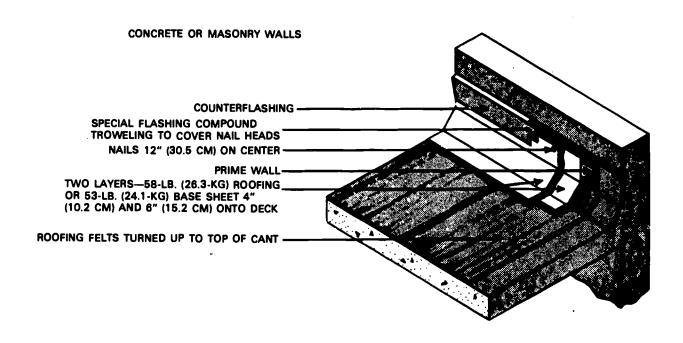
Flashing for cap sheet, slate, mineral, and alumi-shield roofs
